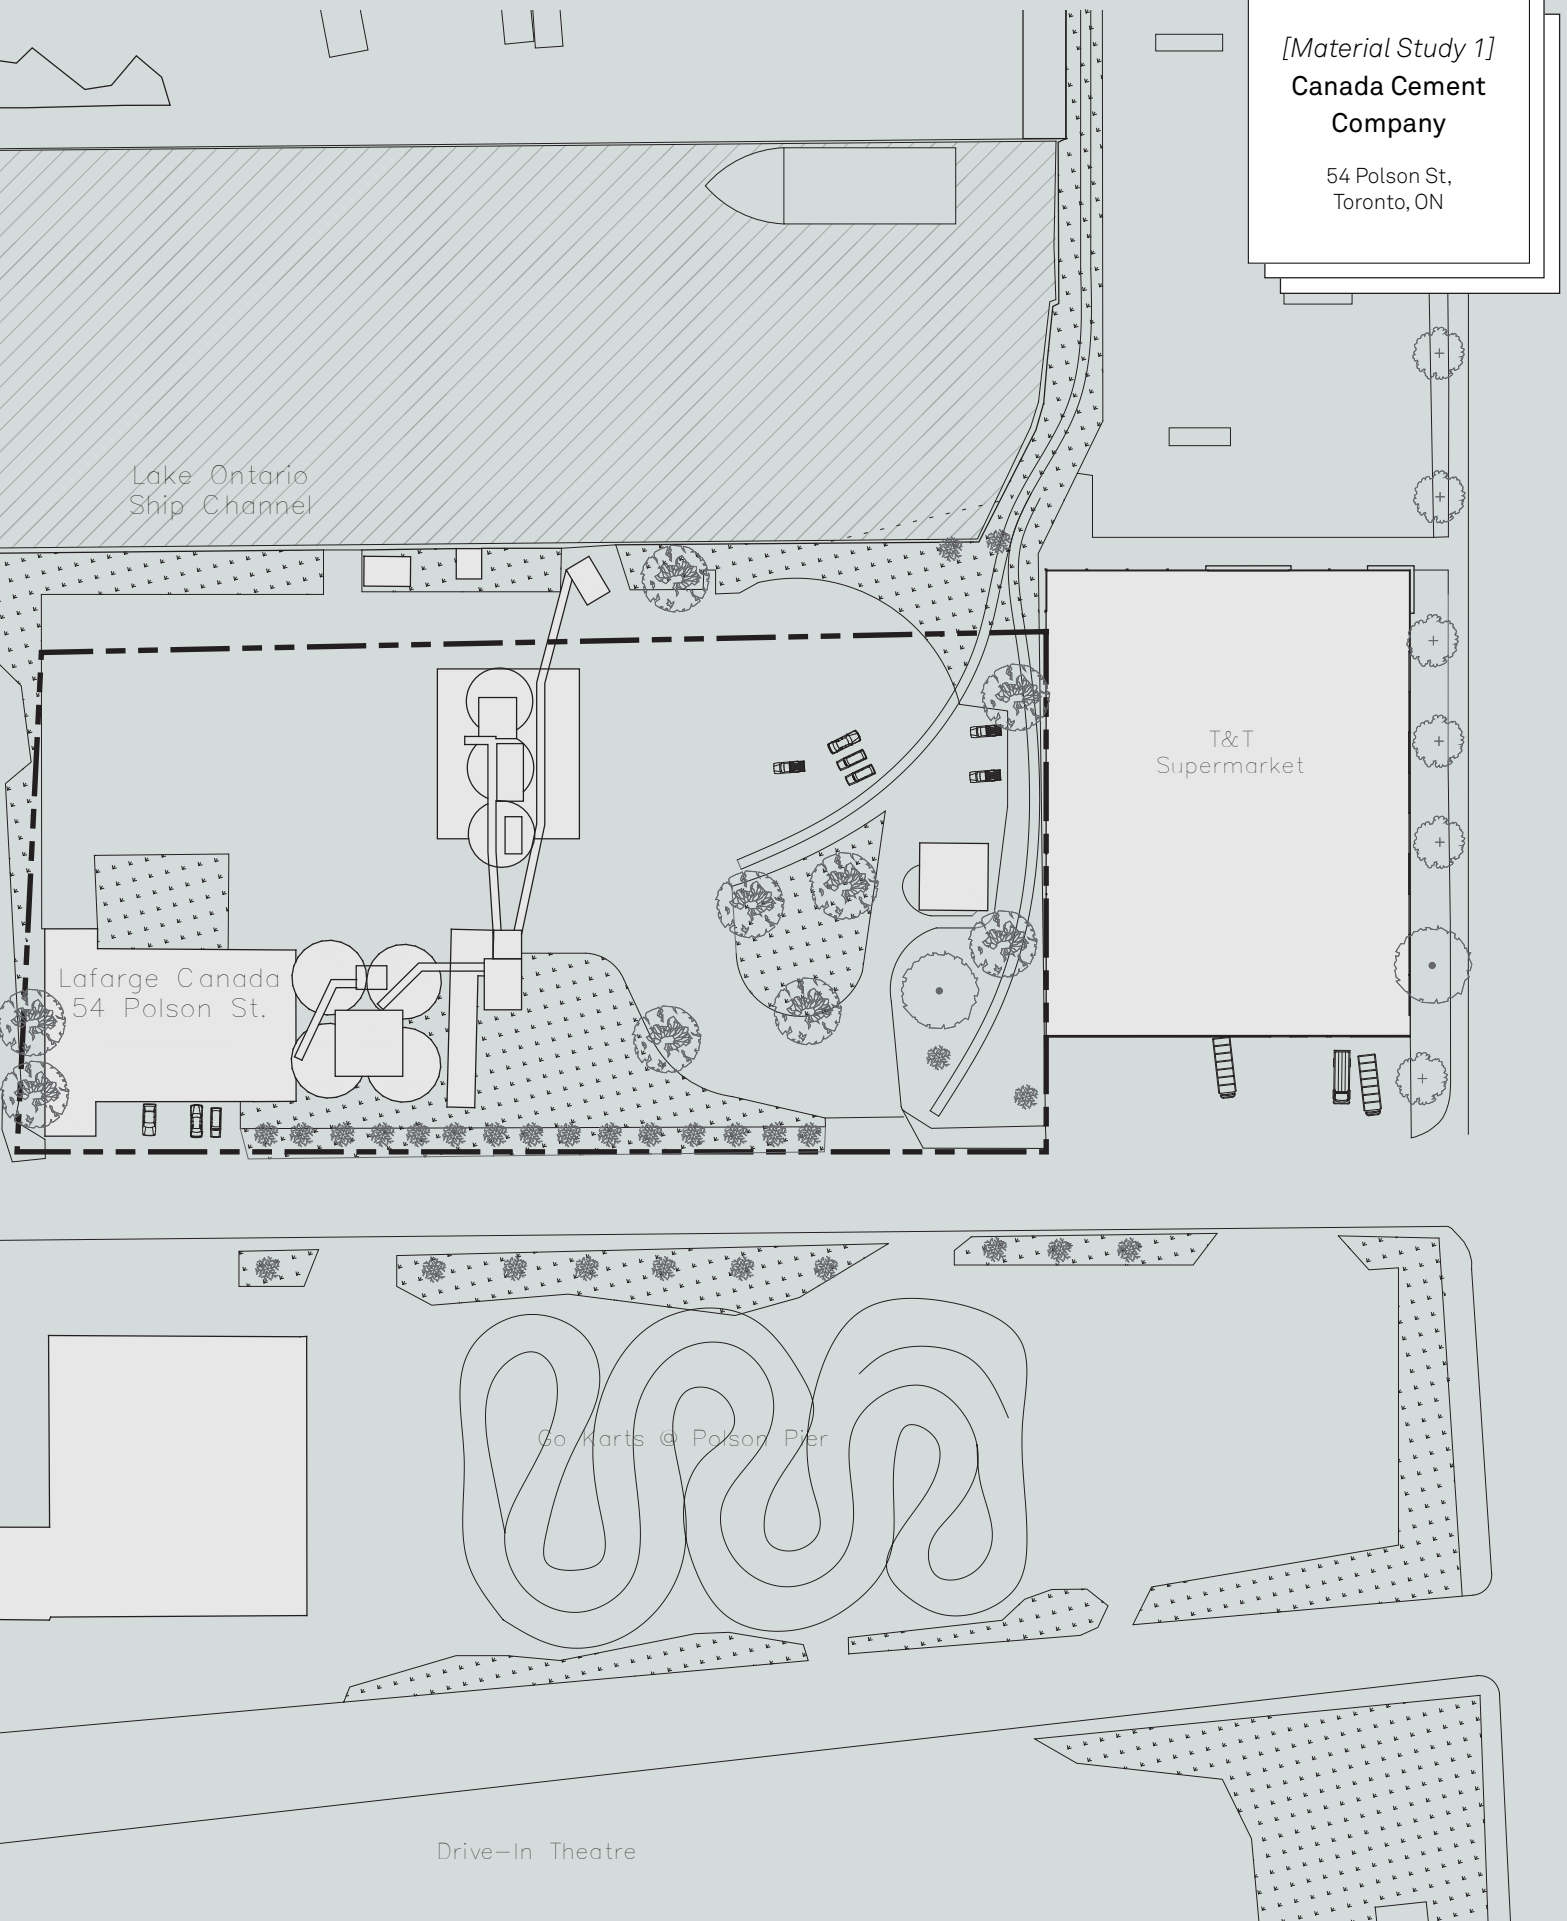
Site plan of Canada Cement Company and surrounding context.
